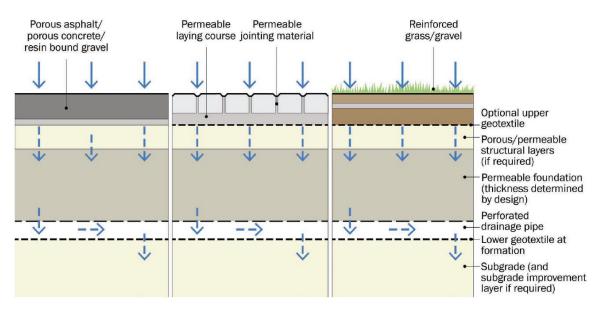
Detail of Type B Pervious Paving (CIRIA C753)
